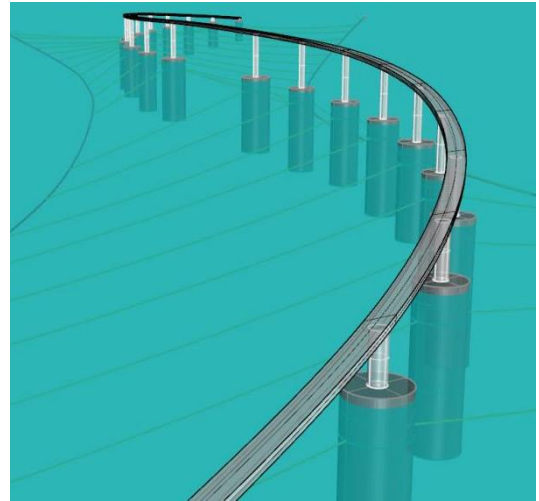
CYLINDRICAL SHAPED PONTOONS
